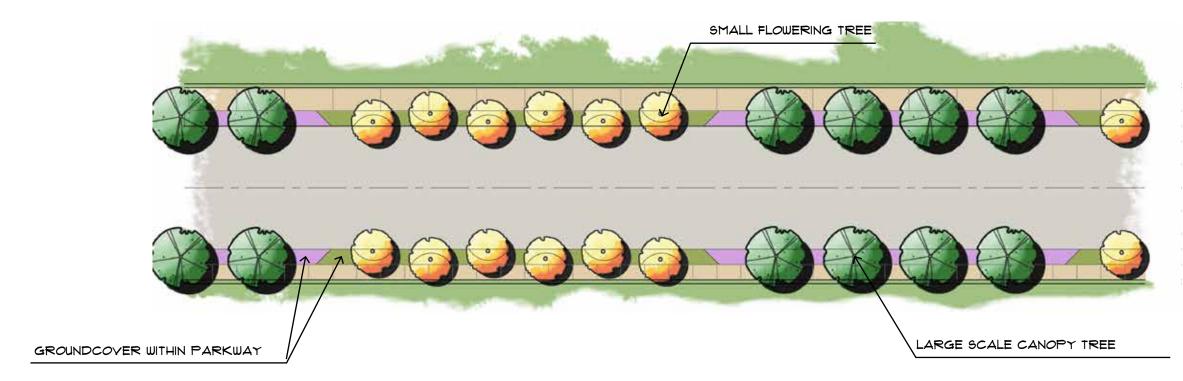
A: SECONDARY HIGHWAY (64' RIDGE ROUTE ROAD)-NORTH OF NORTHLAKE BLVD
